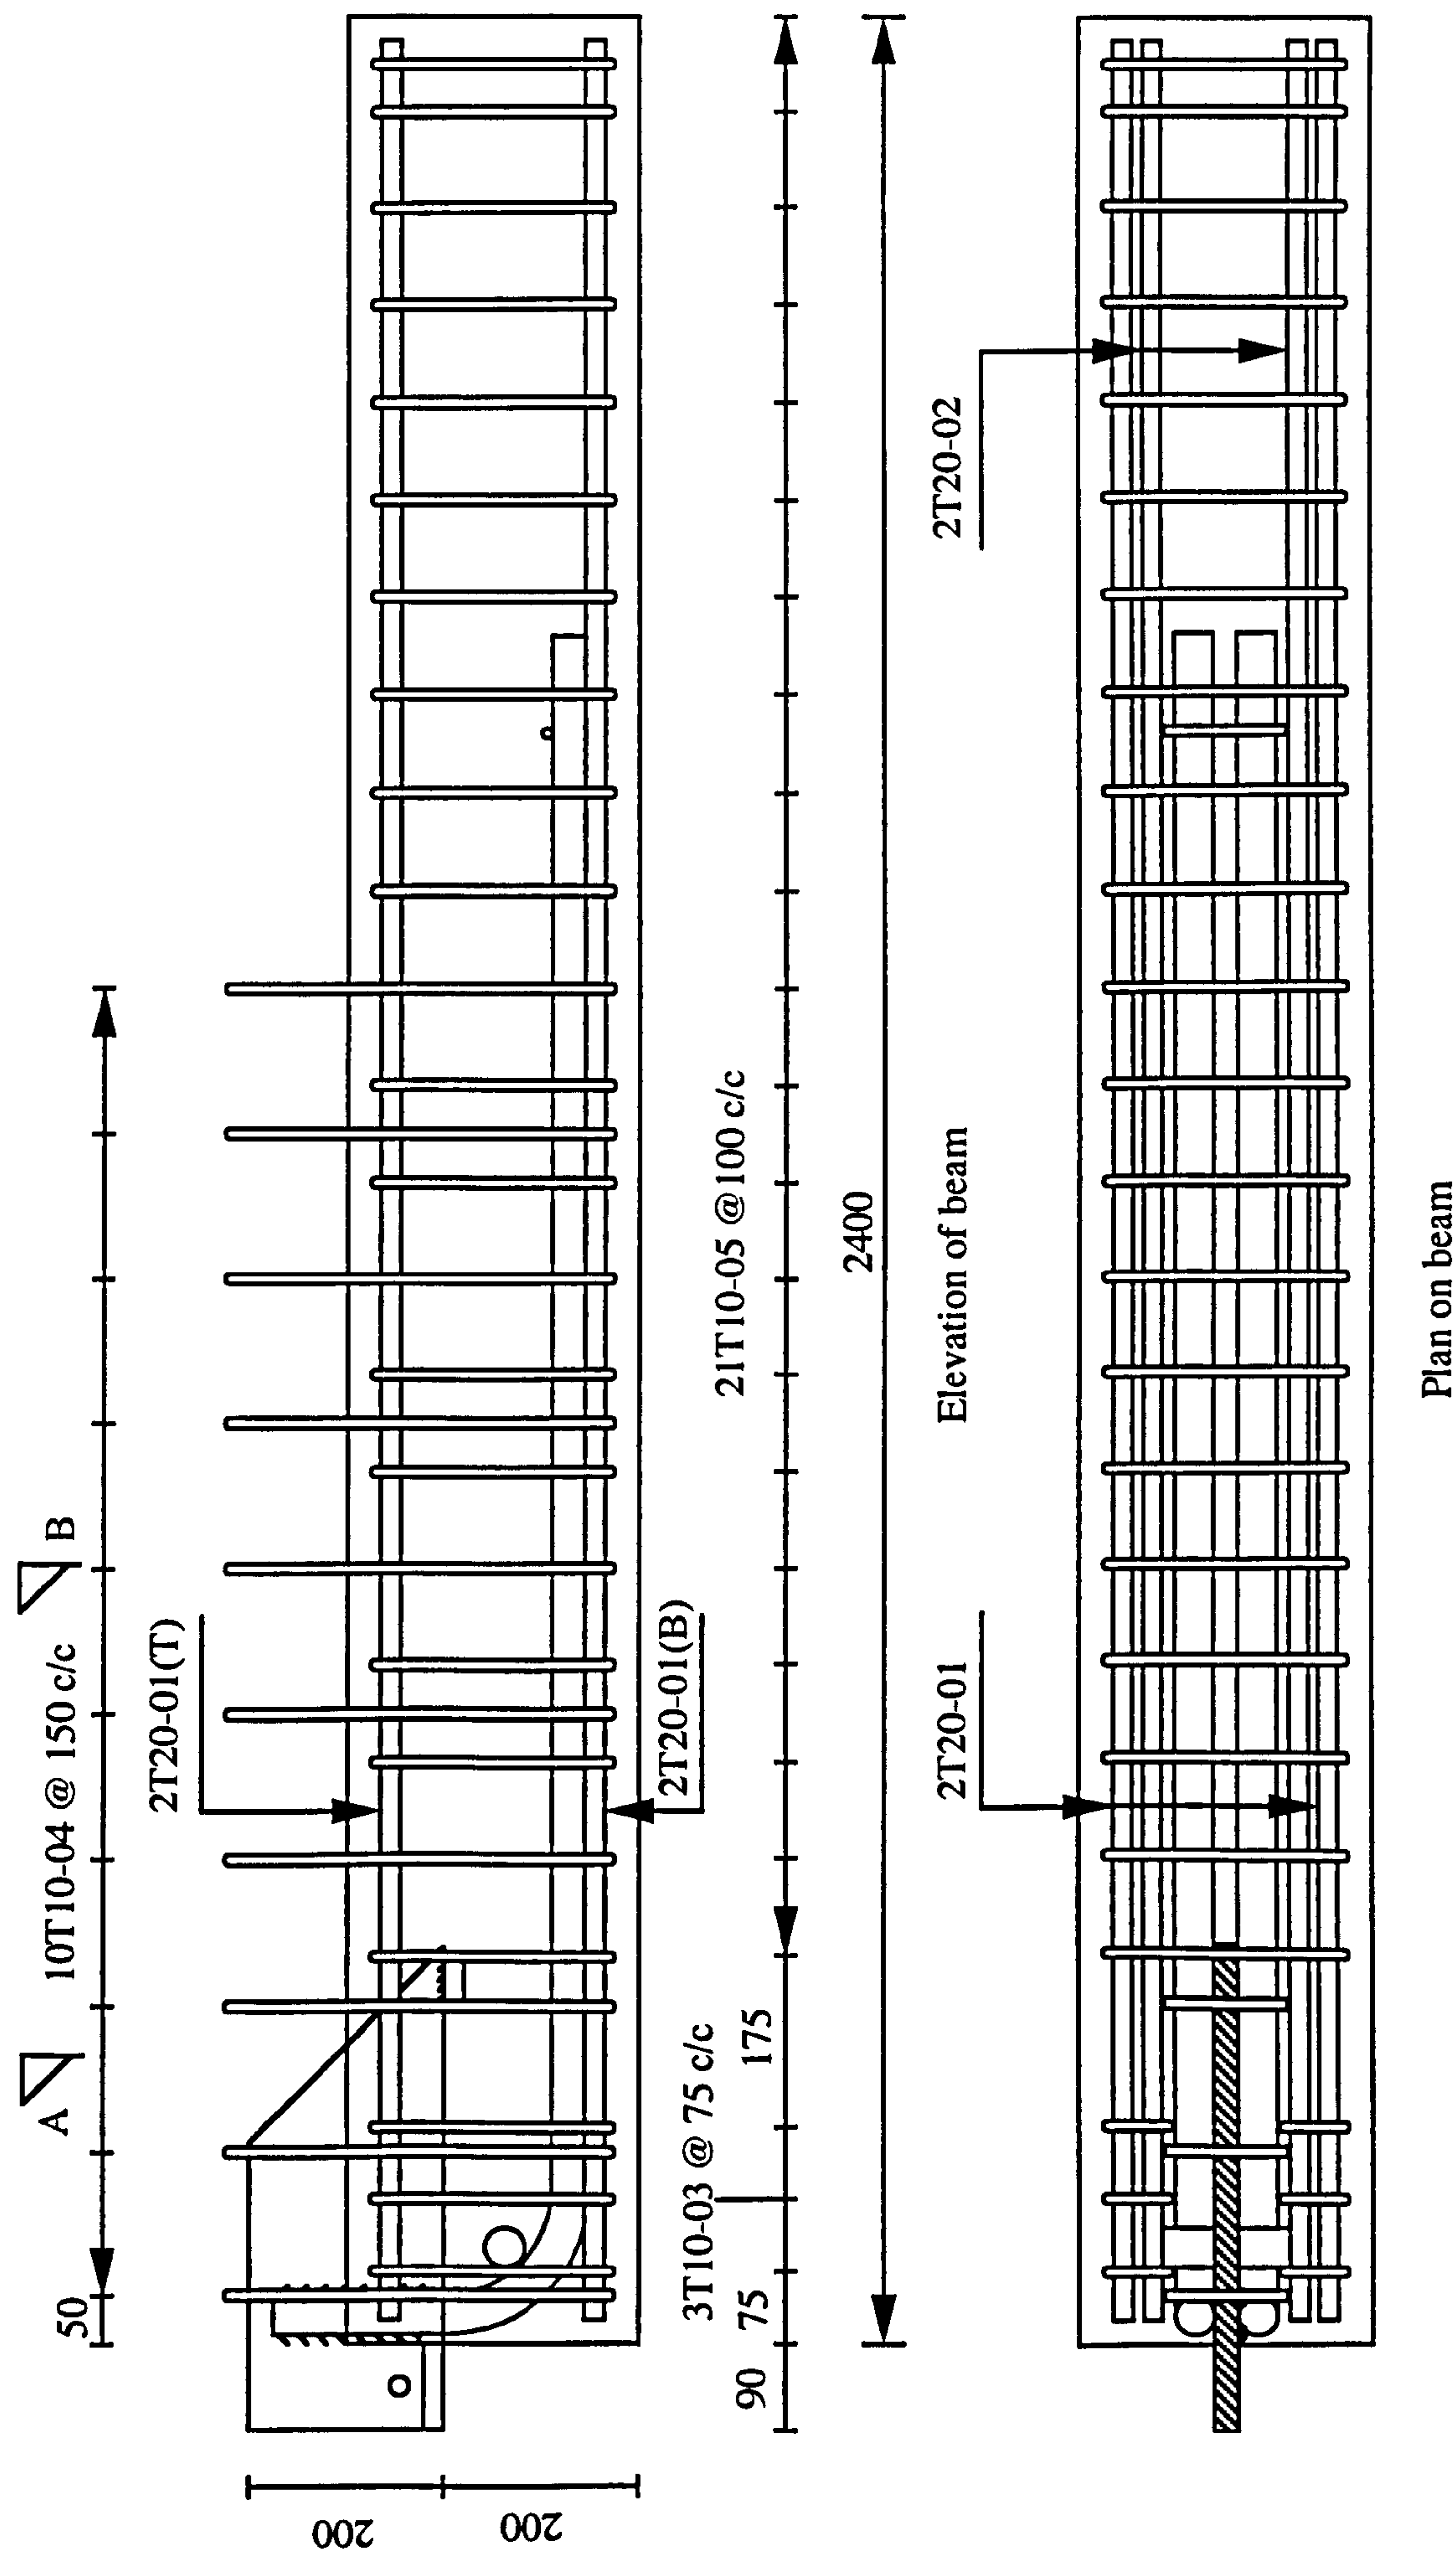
(a): Reinforcement details of beam in test series 1 and 2
